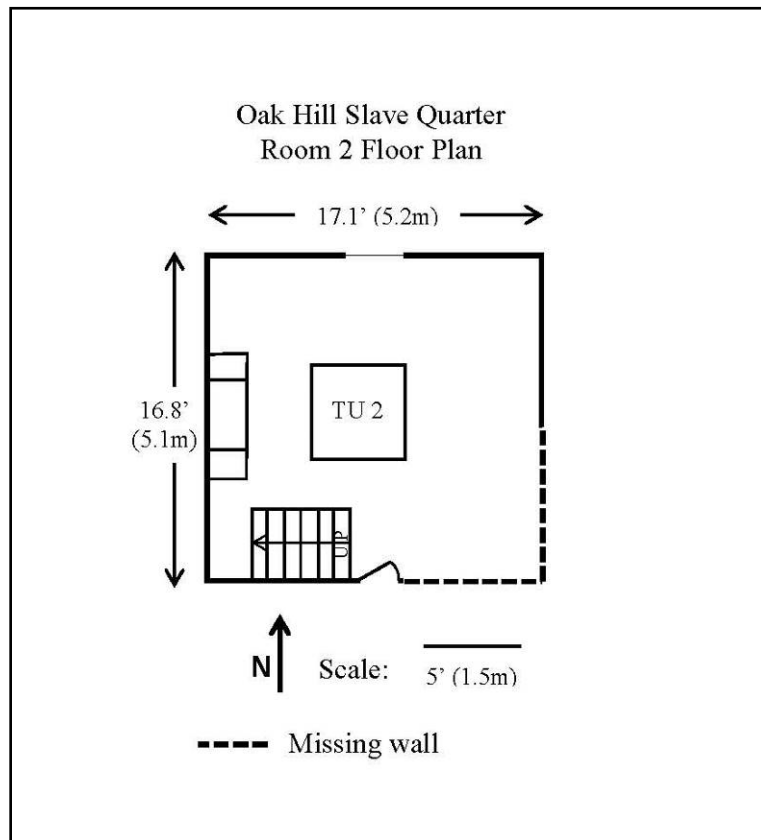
Oak Hill slave quarter Room 2 floor plan.
